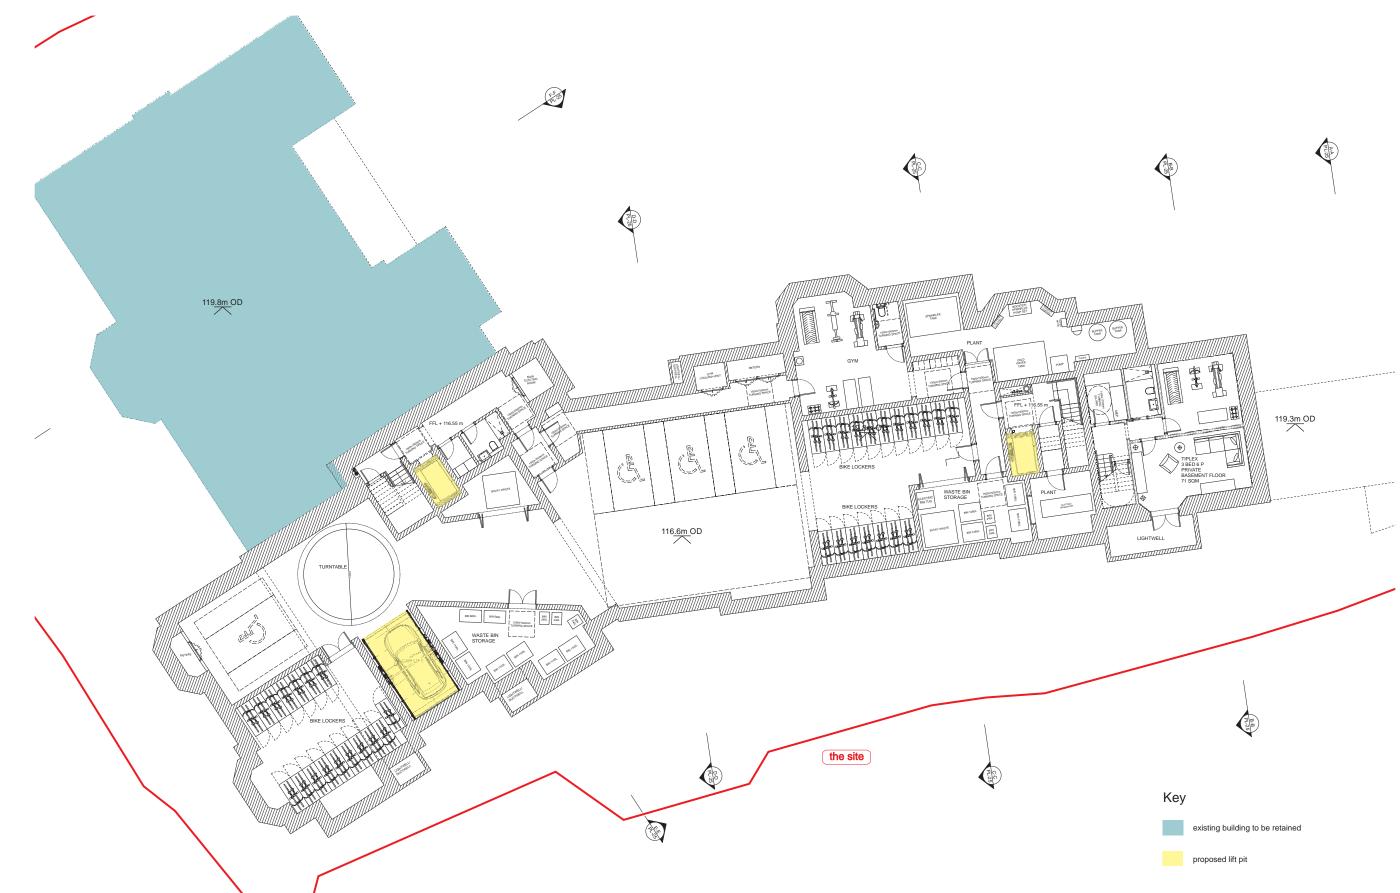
Proposed basement floor plan with proposed floor level (Stanhope Gate Architecture, Proposed Basement Plan, dwg. PL-17, 12-2019)
